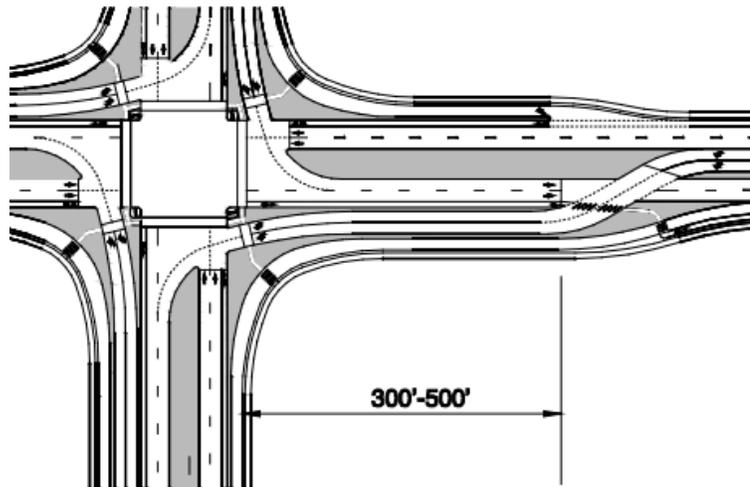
Typical Intersection Spacing at DLT Intersection Designs
